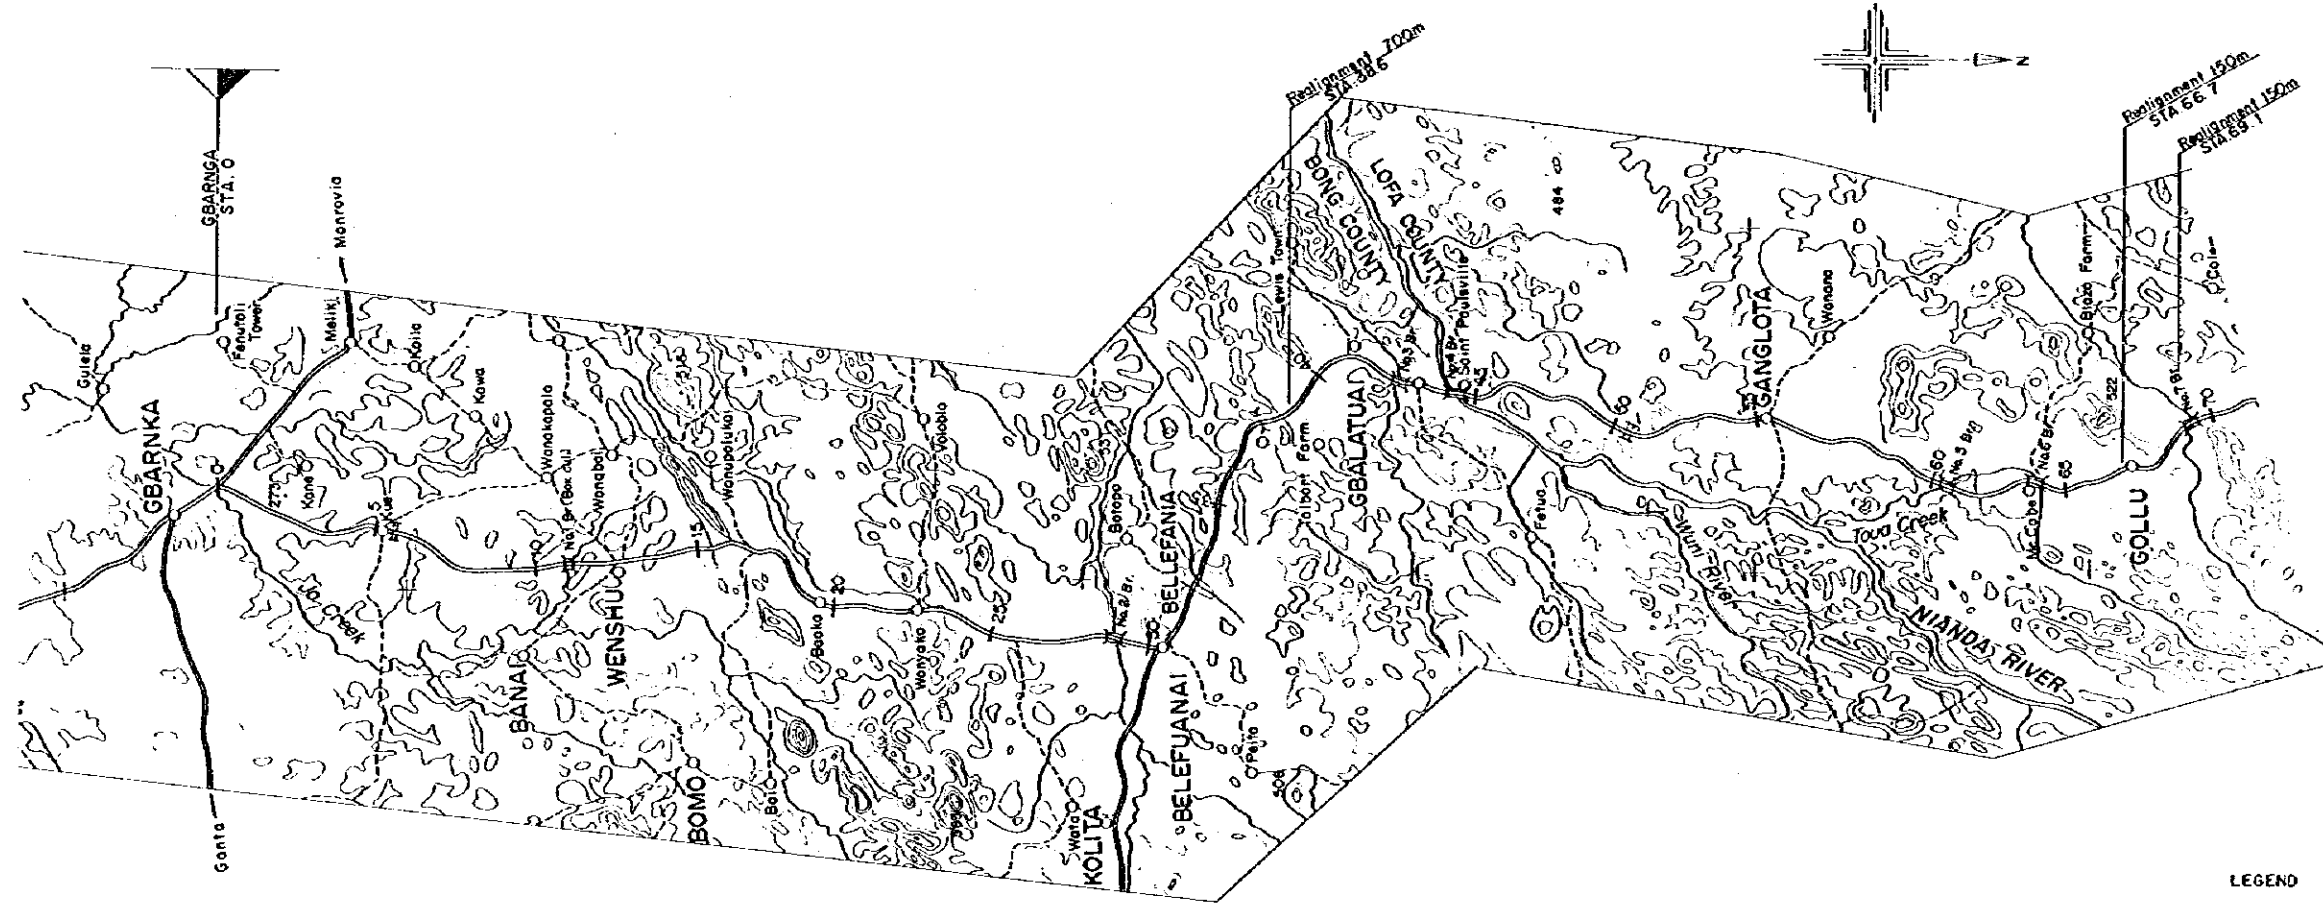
(2) ROAD PLAN AND PROFILE
